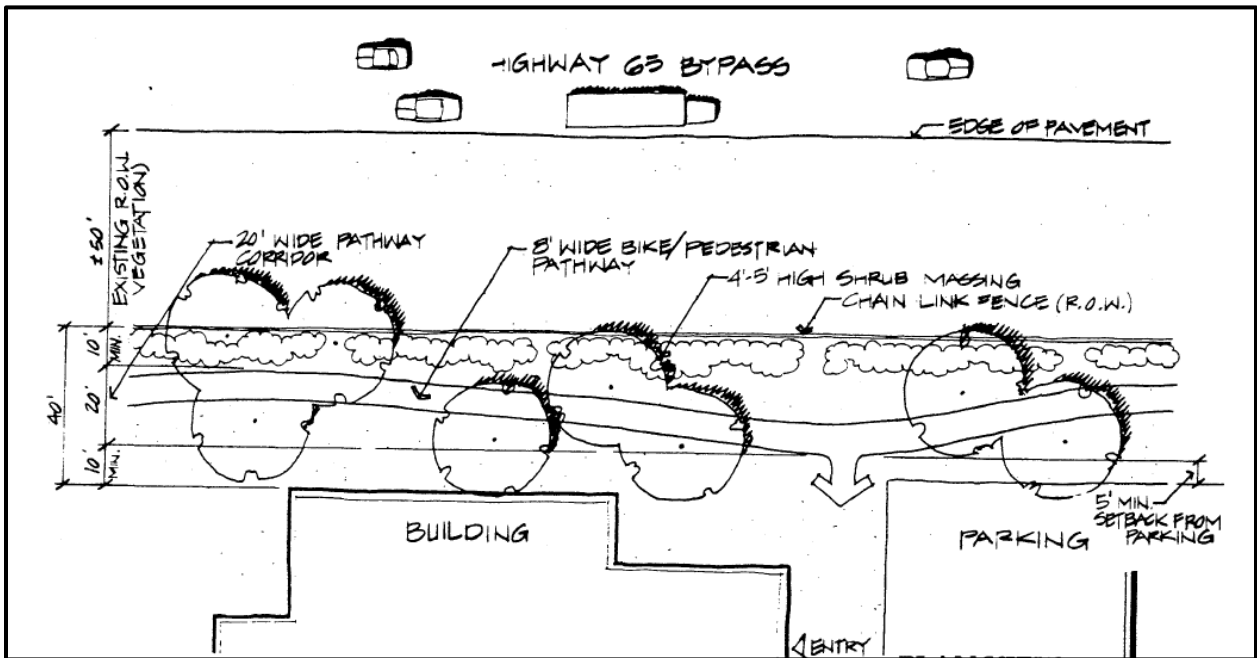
PLAN VIEW - Bikeway Easement Adjacent to Highway 65 Bypass
